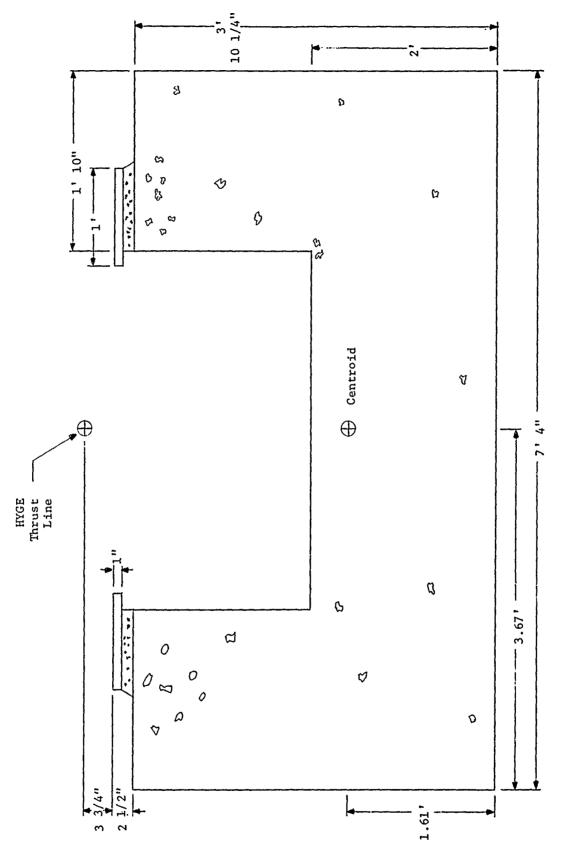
CROSS-SECTION OF T. JK FOUNDATION
